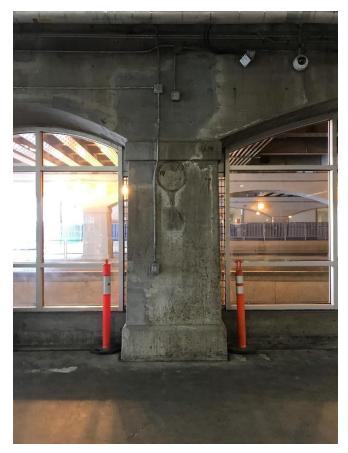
Example of existing column in West Teamway. Columns will be retained and supported with new infrastructure below grade.
